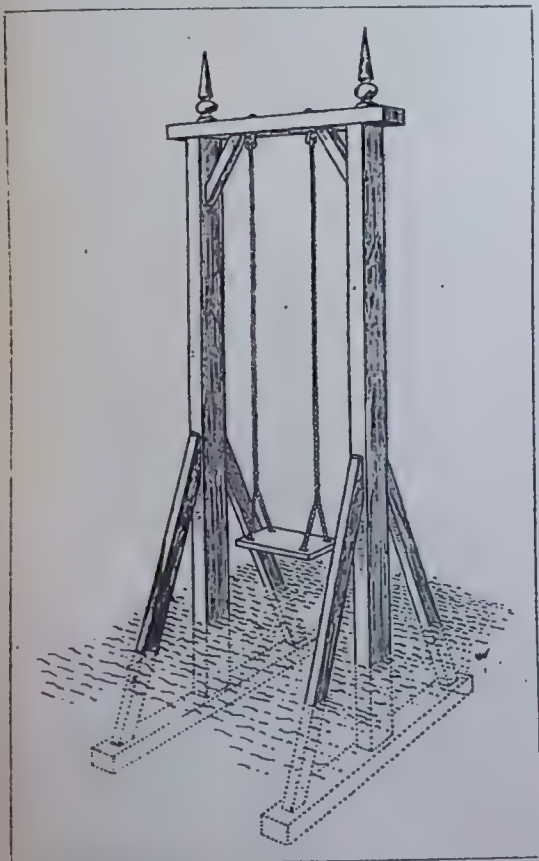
SKETCH OF TRUSSED GARDEN SWING.
